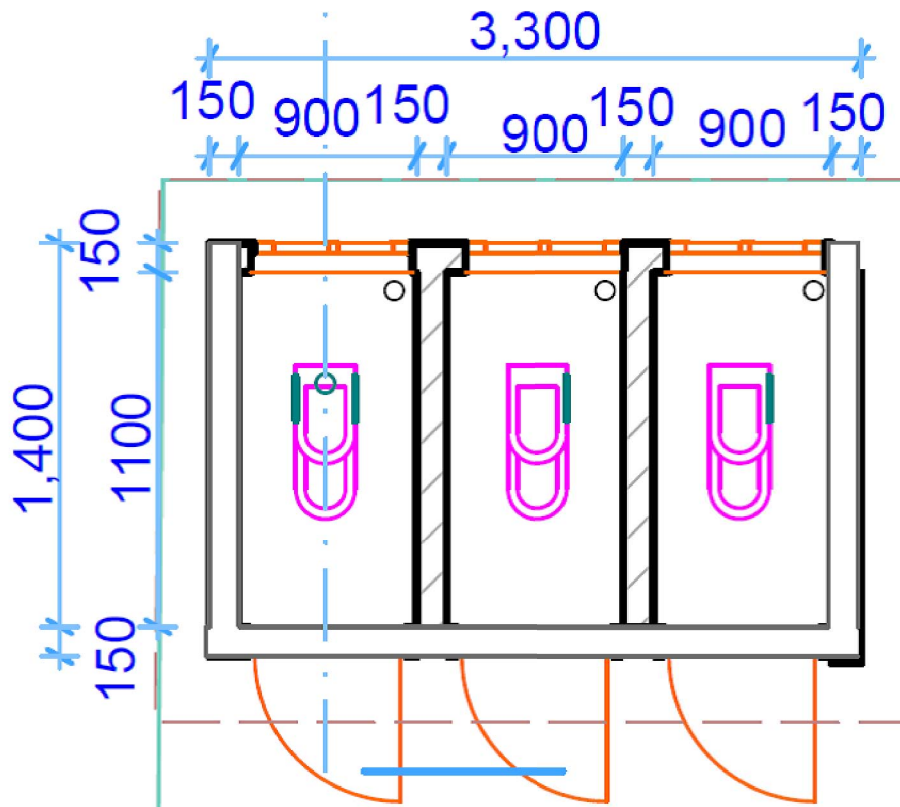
Floor plan of residential UDDTs (ROSA Nakuru; 2009)
